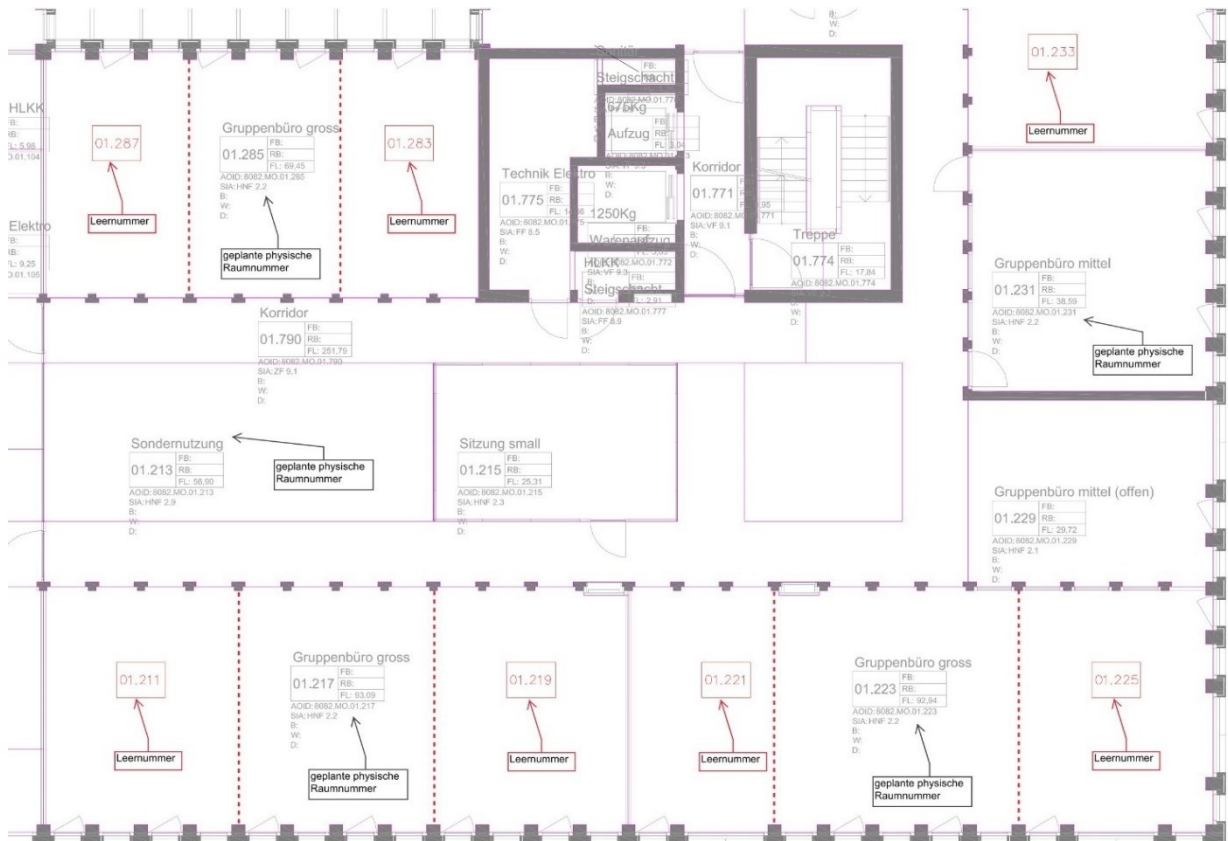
Example of a floor plan with spare number allocation (spare numbers shown in red)
